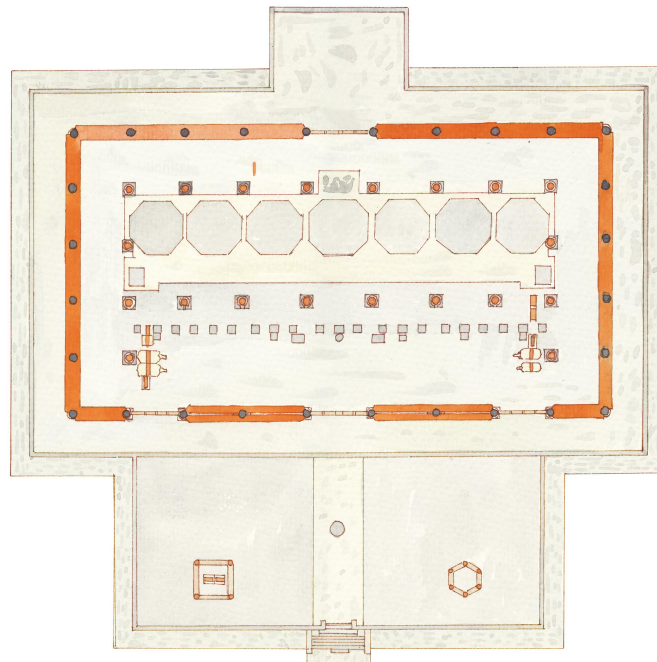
Floor Plan of the Main Hall of Fengguo Temple
